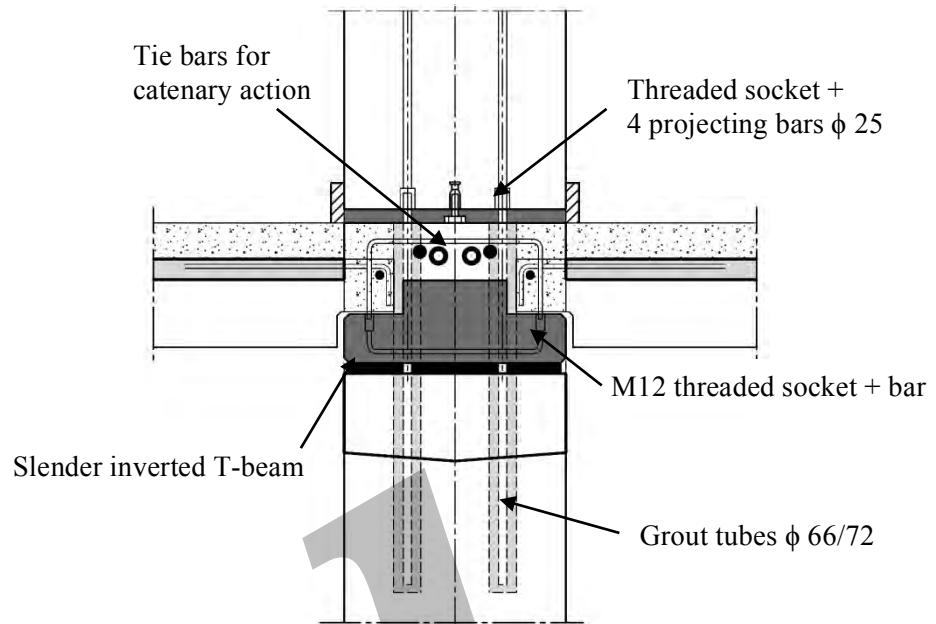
Detailing of a connection between ribbed floors, inverted T-beam and column
